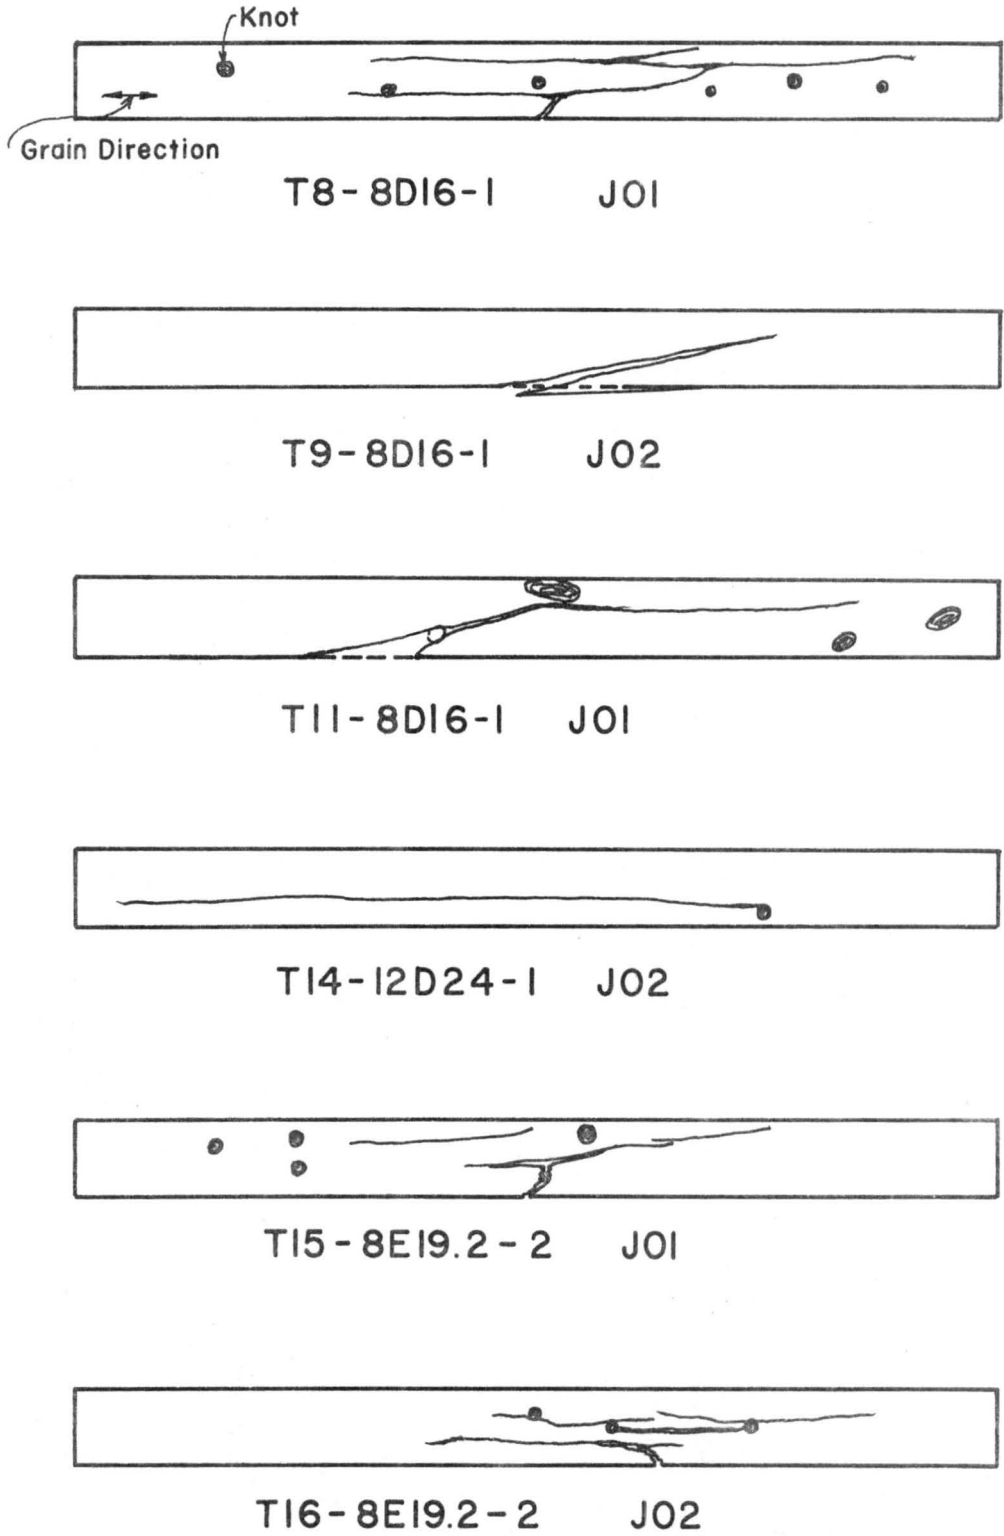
TYPICAL FAILURE TYPES OF T-BEAM
